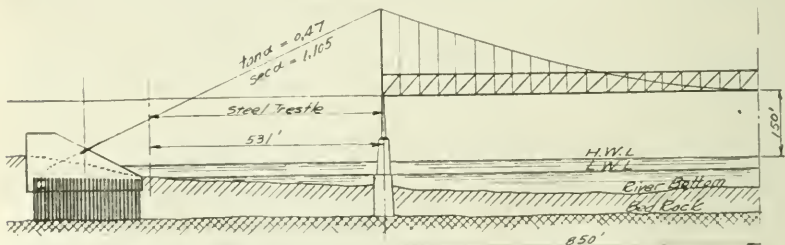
Layout for 1,700-foot Span Suspension Railway Bridge.
